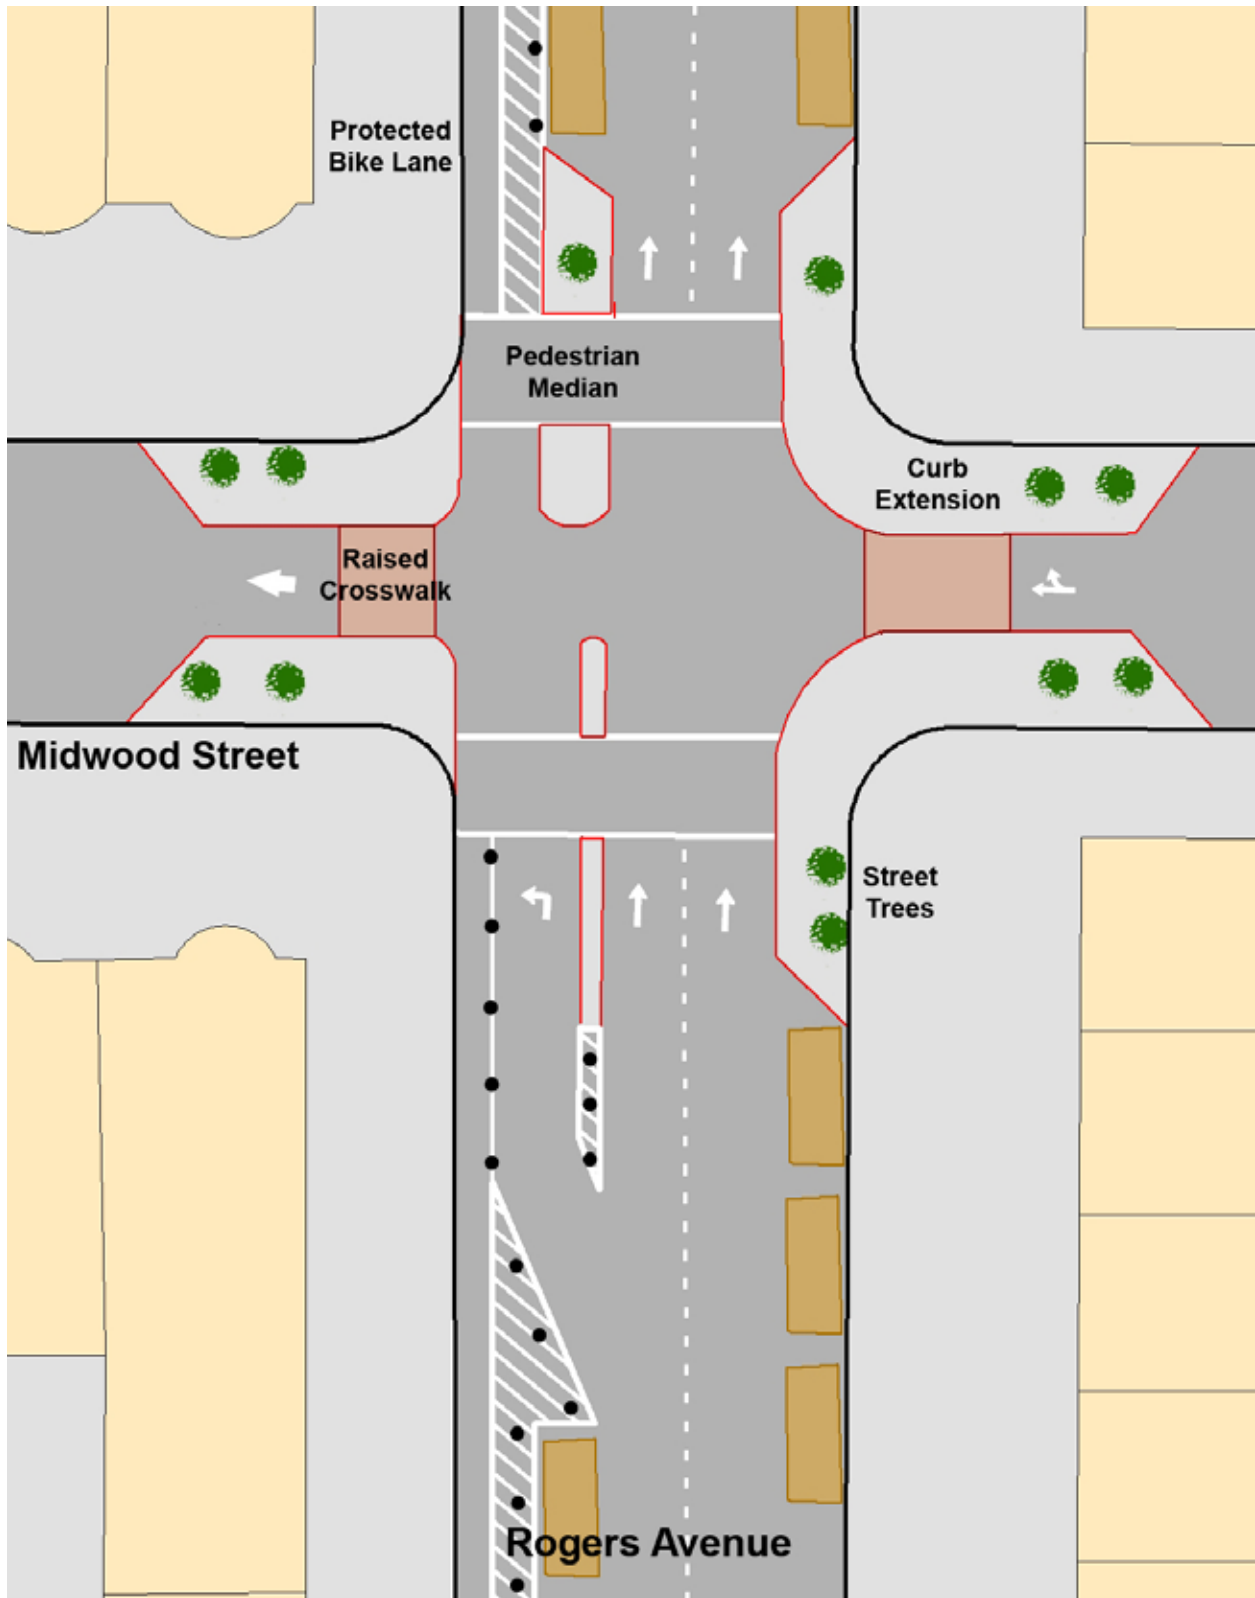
Drawing of Rogers Avenue with a parking protected bicycle lane, curb extensions and raised crosswalks
